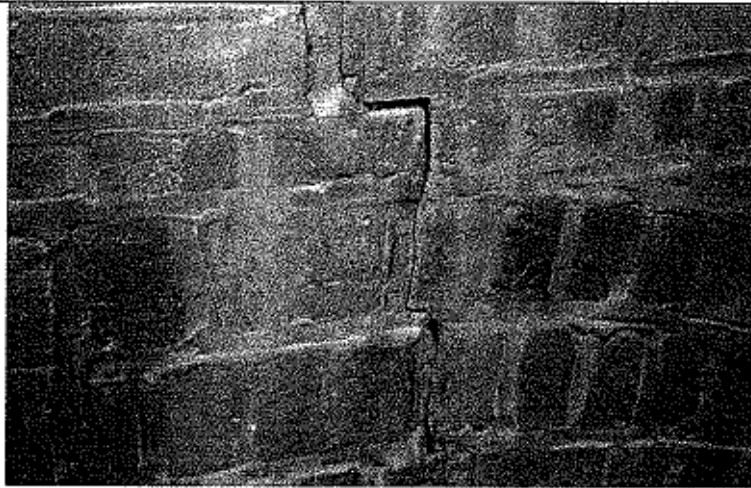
Cracked and loose mortar joints above windows. Surface appears to have shifted. Condition is typical for areas above windows on the east, west and south elevations.
